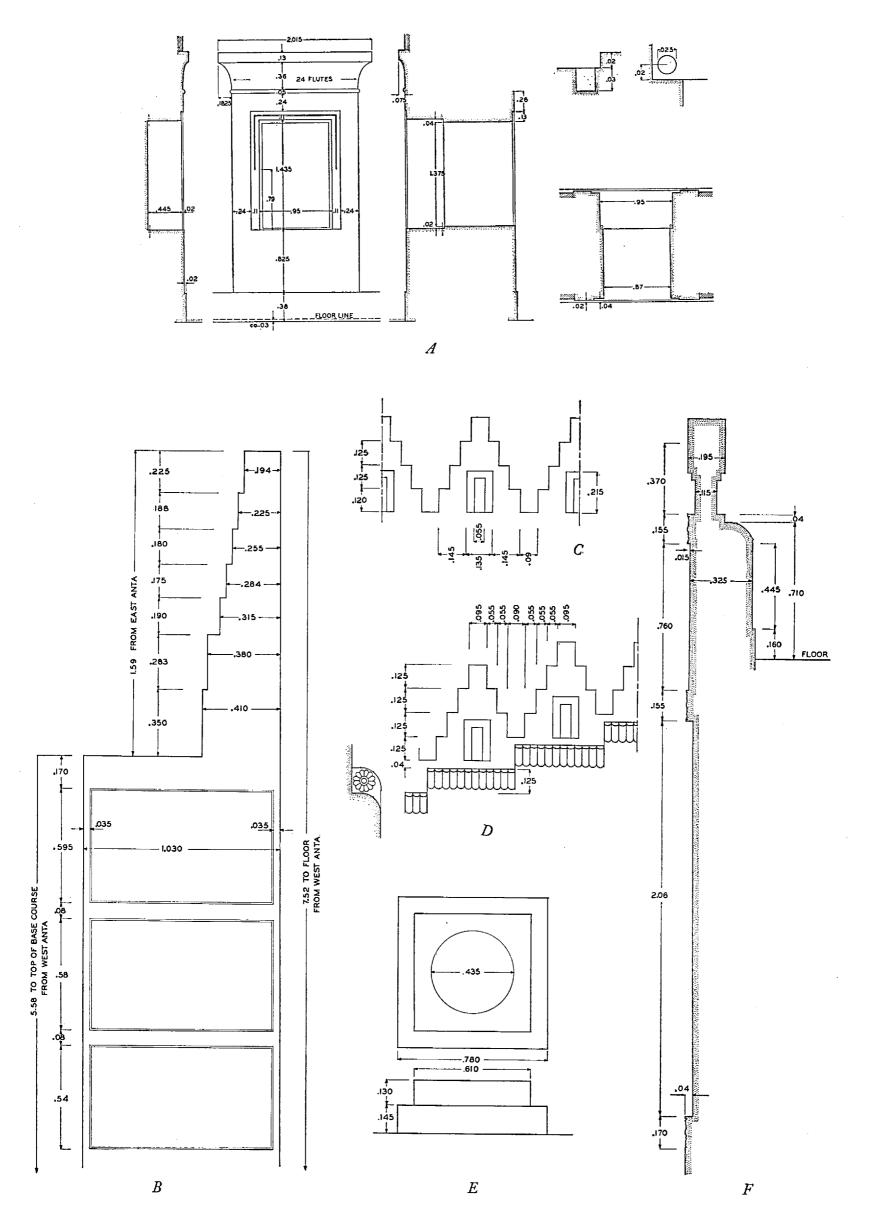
Palace of Darius. A. Plan of Windows and Elevation and Sections of Niches and Windows in Main Hall. B. Profile of Antae, with Inscription Panels. C. Crenelations on Parapet of Portico. D. Crenelations on Parapet of East Flight of Southern Stairway.
